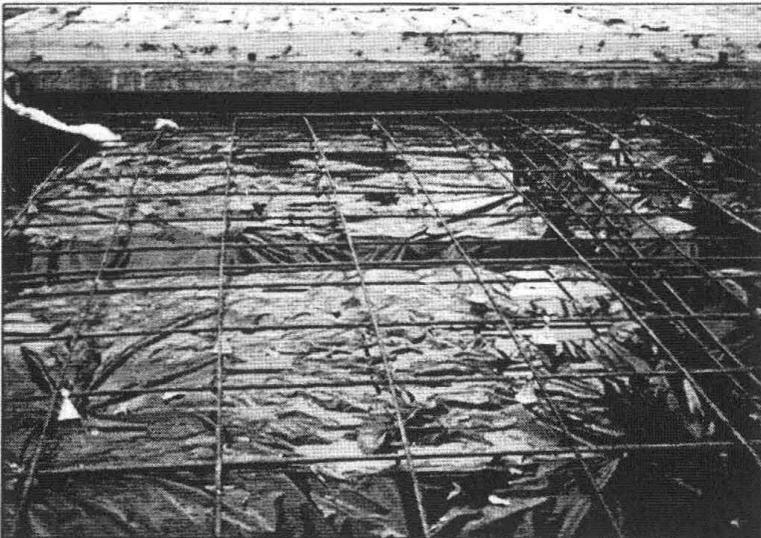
A polyethylene sheet vapor retarder under a concrete slab-on-grade. The photograph shows steel reinforcing bars laid over the vapor retarder. The reinforcing bars will be embedded in the concrete.
